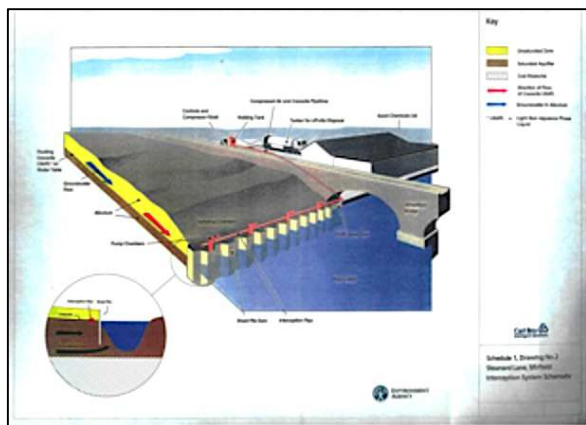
Sheet pile wall and interception trench, constructed to protect Calder River
